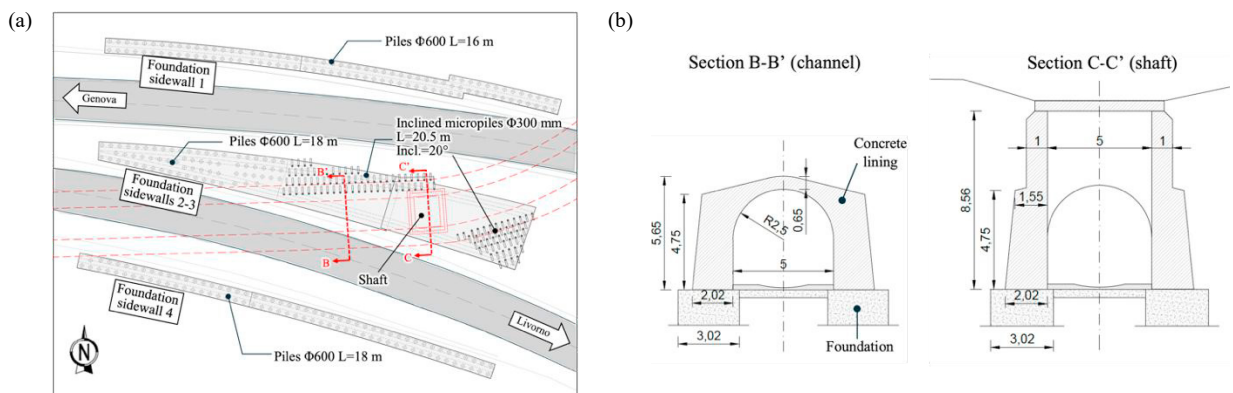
(a) Plan view of the foundation layout of the Torbella artificial tunnel; (b) Cross-section of the channel (section B-B') and of the shaft (section C-C').
